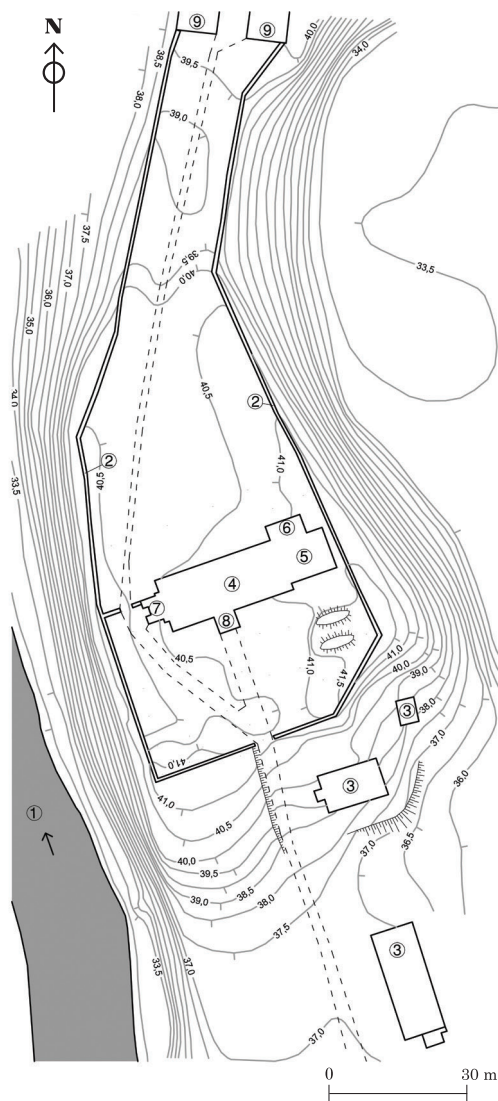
Plan of Lügänuše churchyard. Based on the plan by U. Hermann (1975). 1 – Puritse River, 2 – stone wall, 3 – modern buildings, 4 – nave, 5 – chancel, 6 – sacristy, 7 – western tower, 8 – southern porch, 9 – early modern chapels.
